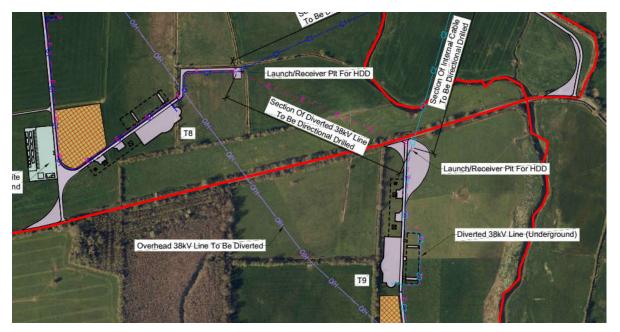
Aerial drawing of section of proposed underground re-routing of 38kv ESB powerline using HDD under Rossestown road and the adjacent field (see pink line between Turbine 8 and the site entrance north of Turbine 9).
